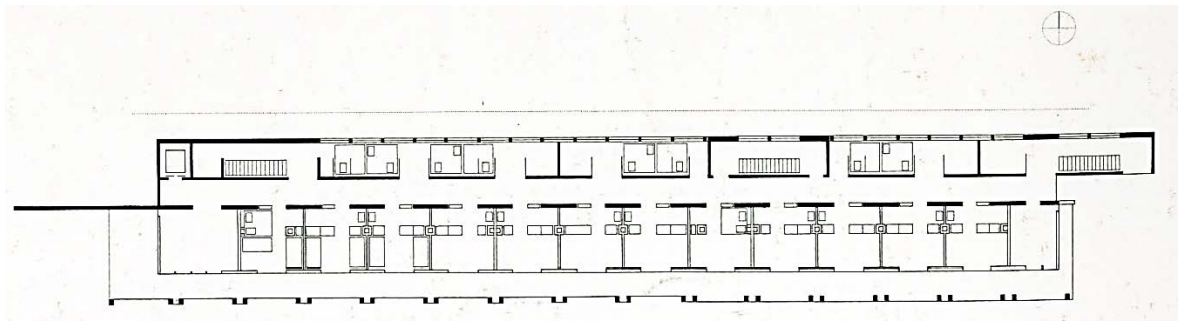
Guest Building, Windberg, Lower Ground floor plan
